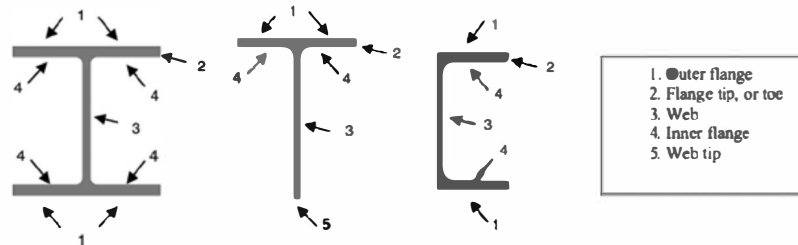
Component Names of Girders, I-sections, Tee Sections, and Channels
